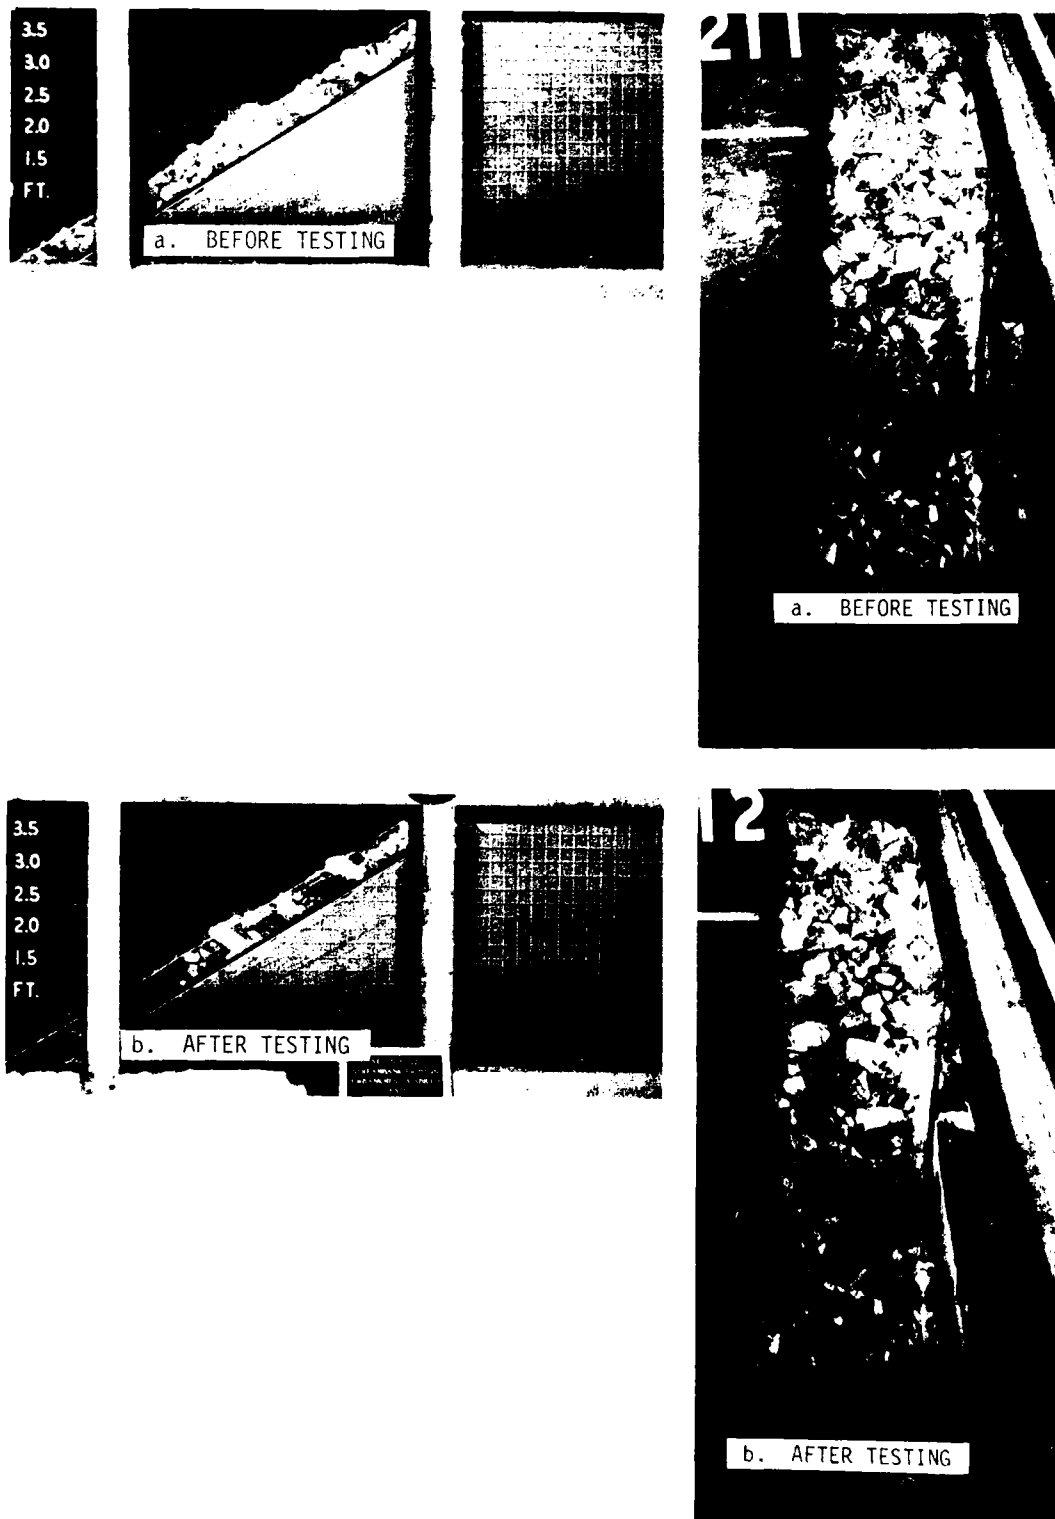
Plan 5A, before and after testing 4.0-sec, 0.70-ft non-breaking wave combined with 1.5-ft static differential head
